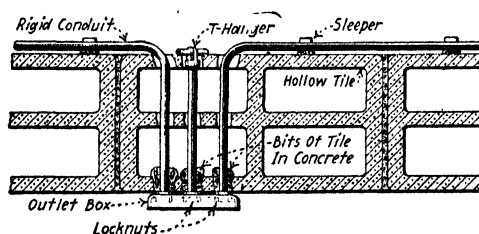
Fourth step, openings in tile around top of box filled in with concrete and bits of tile.
